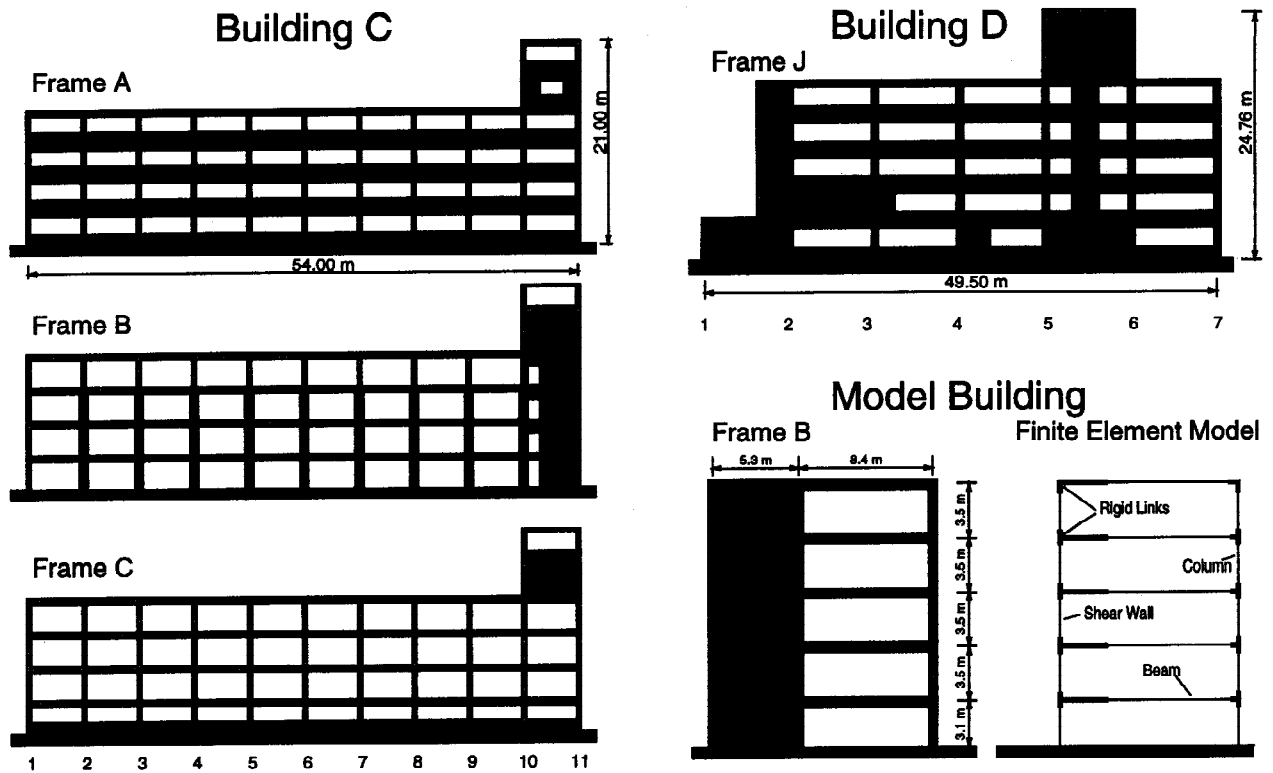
Elevation views of frames for buildings C, D and the model buildings, and finite element model of model buildings
